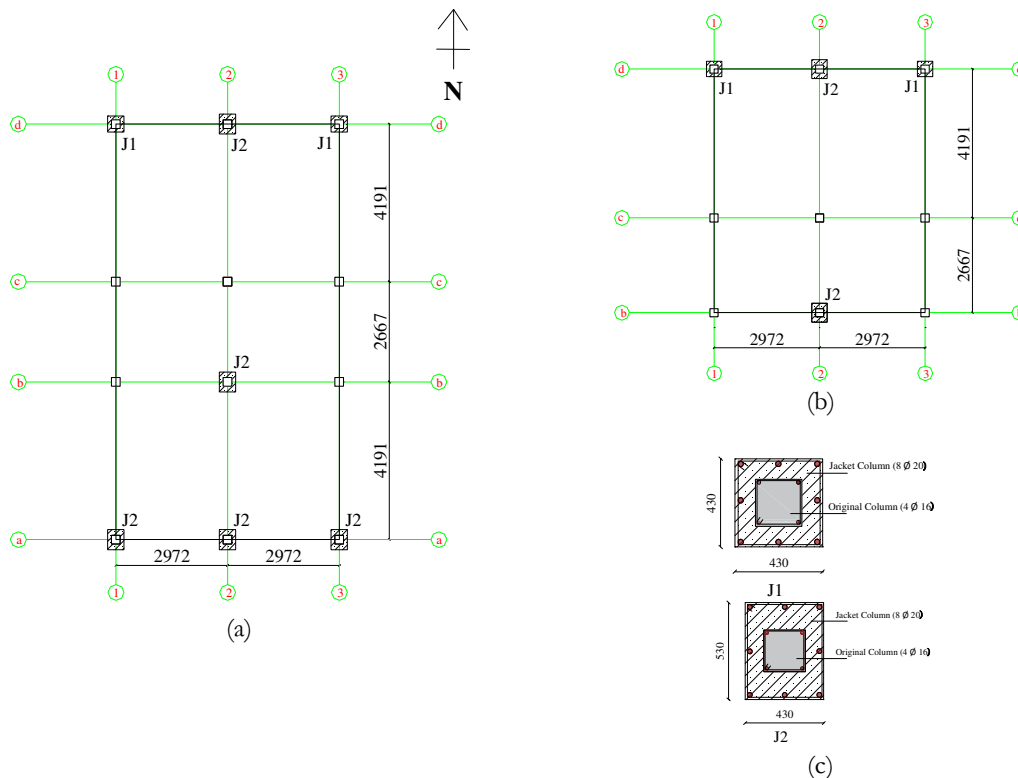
Jacketing layout and reinforcement detailing in the CCP2 building; (a) Ground, first and second floors plan, (b) Top floor plan and (c) Section and reinforcement details (all dimensions are in mm)
